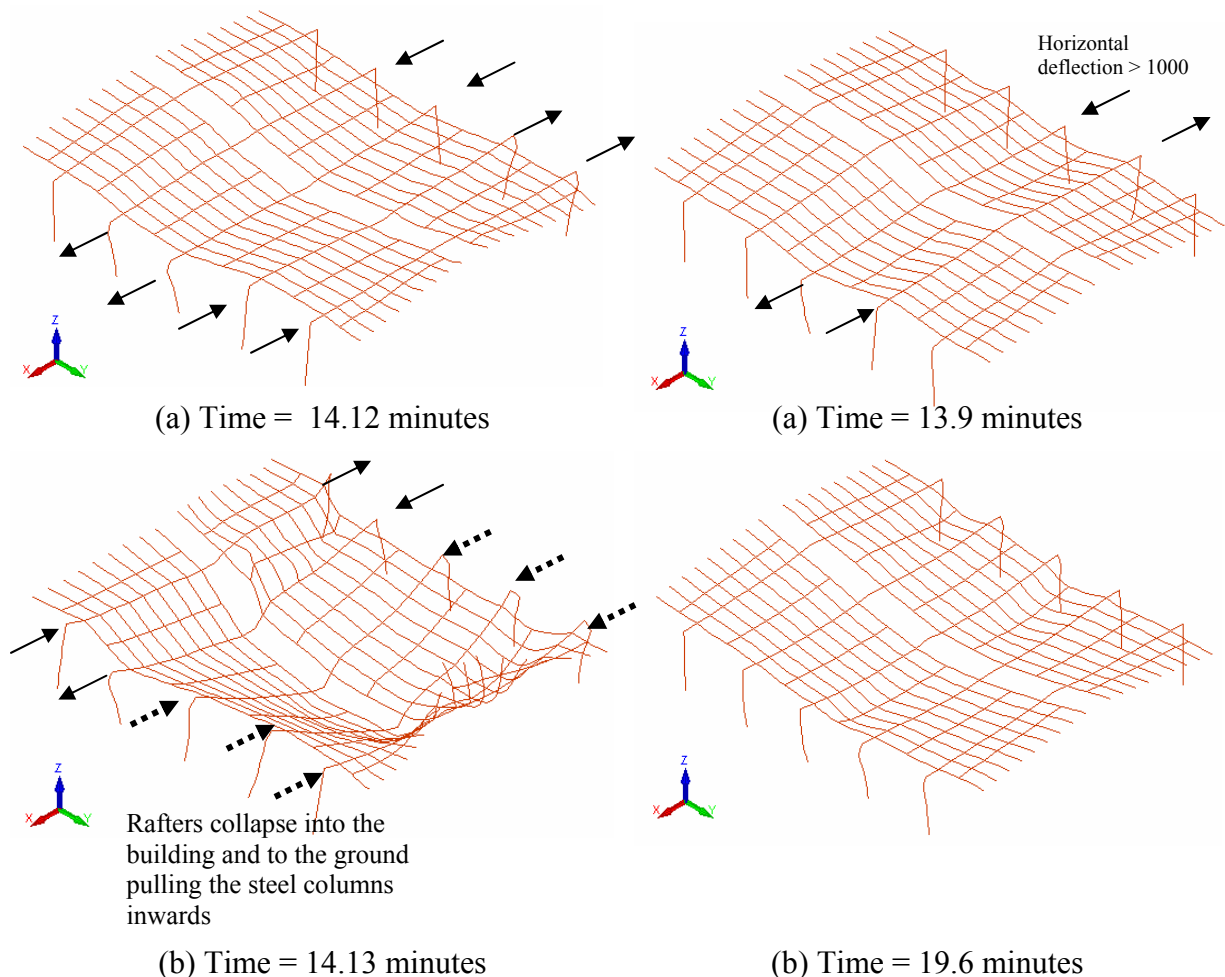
Sidesways collapse of the pinned support structure WITHOUT purlin axial restraint (Scale = 1x)
